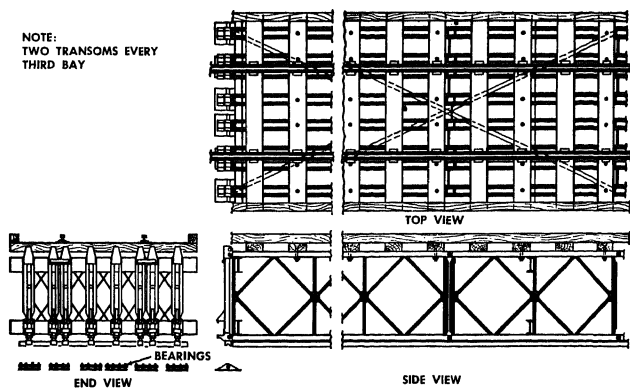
Top, side, and end view of eight-truss bridge showing construction details.
